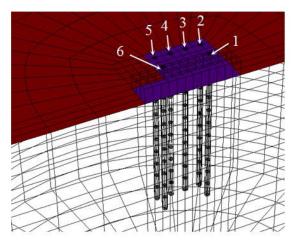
FEM-model with numeration of piles for the final design of the foundation extension with 2 x 6 concrete piles.
